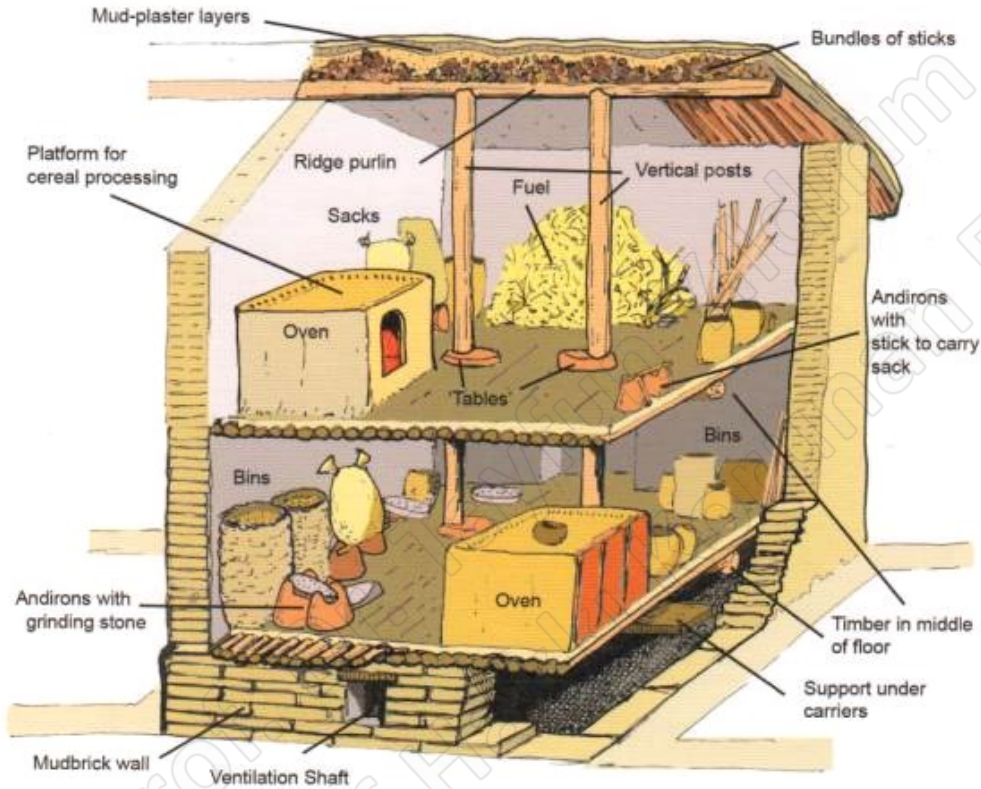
Reconstruction of a typical boundary house of Ilipinar VI. The ground floor as well as the floor of the upper storey are of the grillage type supported by beams secured in the lateral walls. The entrance was from the village side. Ovens were in the corner right to the entrance. In the upper storey similar ovens were often found in the same corner.
